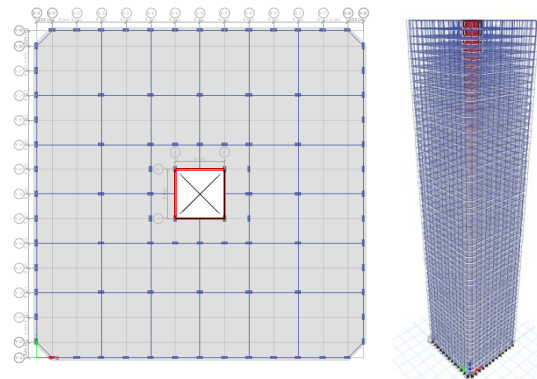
Plan and 3D Elevation for Hull-Core Structure
